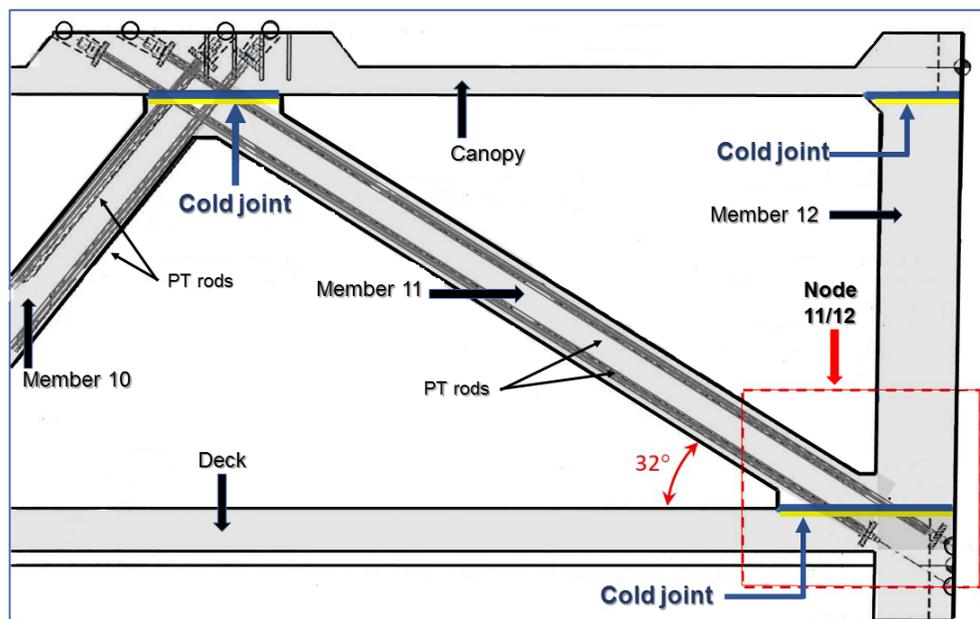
Cold joints on pedestrian bridge main span north end, at intersection of members 10, 11, and 12 at canopy and at node 11/12 connection to deck at pylon pier. [Note: View is looking west]
